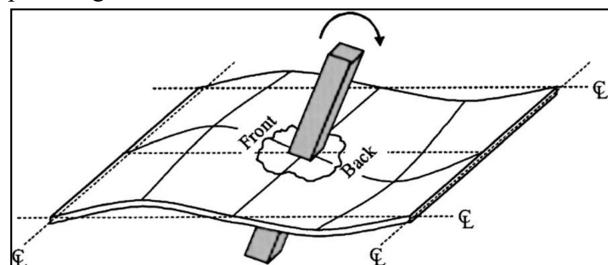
Behavior of Slab-Column Connection in Flat Slab Structure
